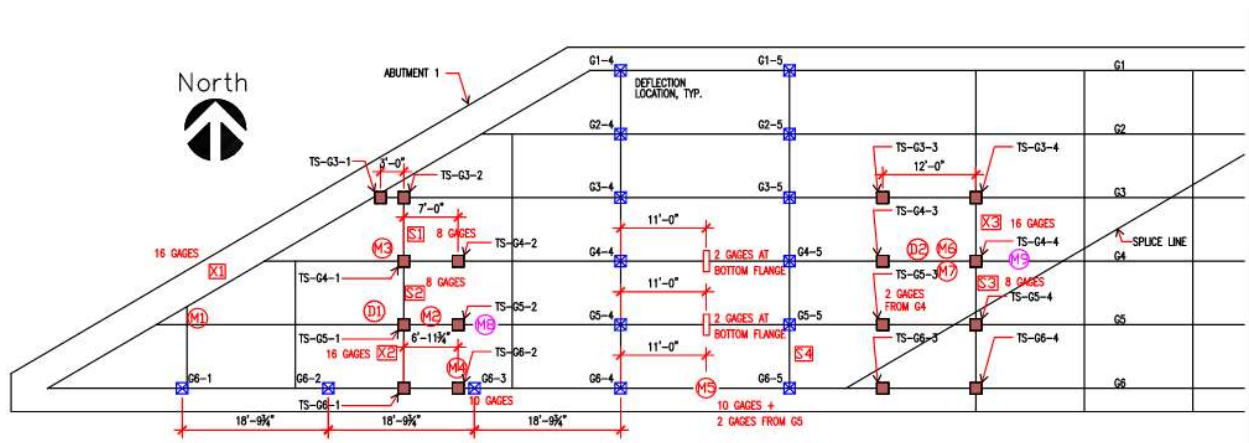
Lubbock Bridge Instrumentation Plan (Romage, 2008)
